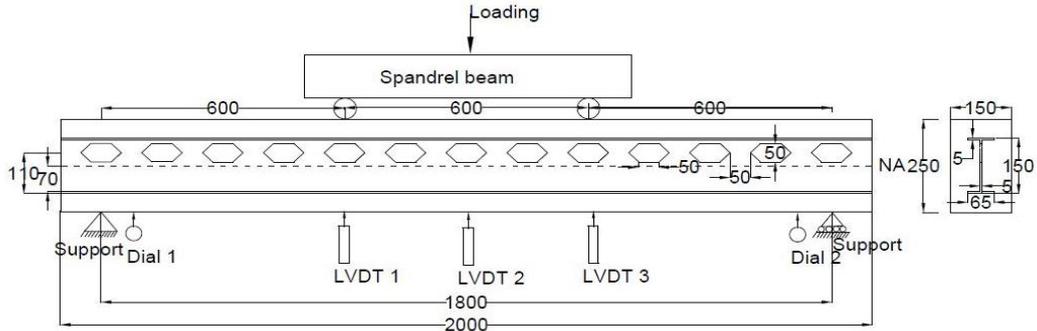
Loading setup of concrete encased steel castellated beam opening above NA (CESB- H2)
